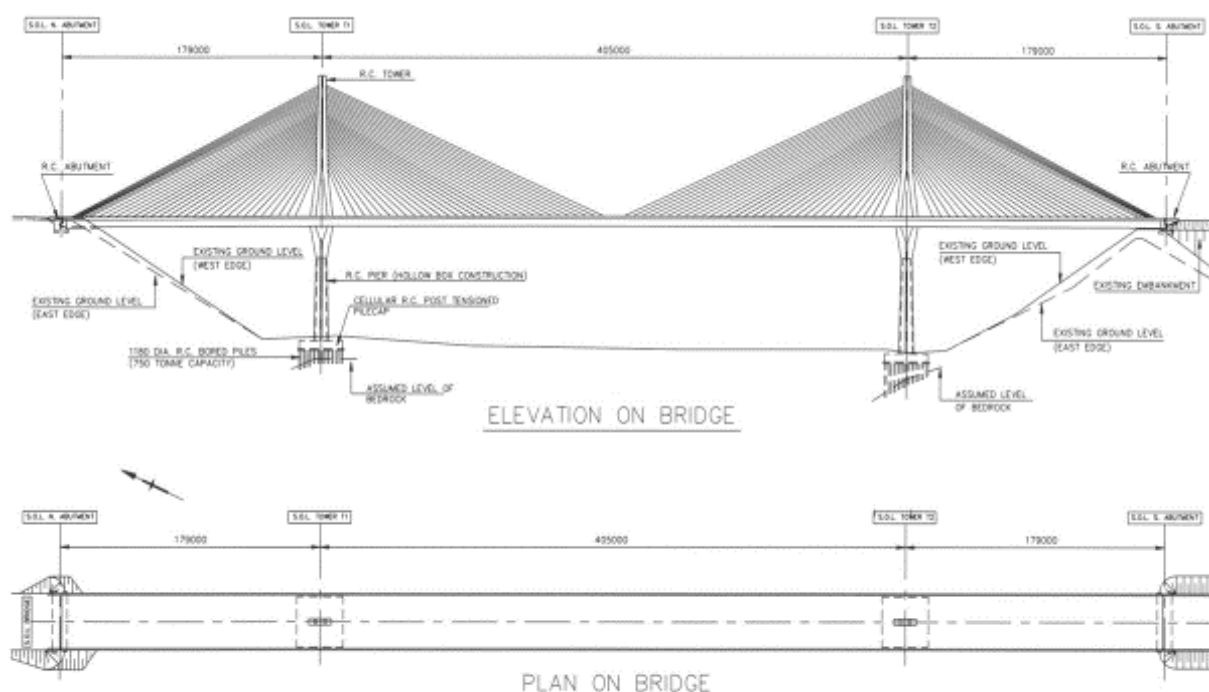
Wadi Leban Bridge: General Arrangement Drawing
